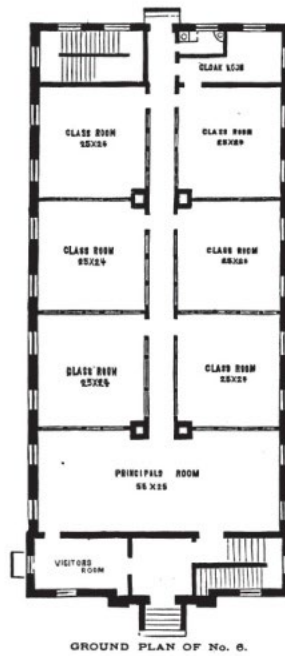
FIRST FLOOR PLAN OF GRAMMAR SCHOOL No. 6 (P.S. 103)
